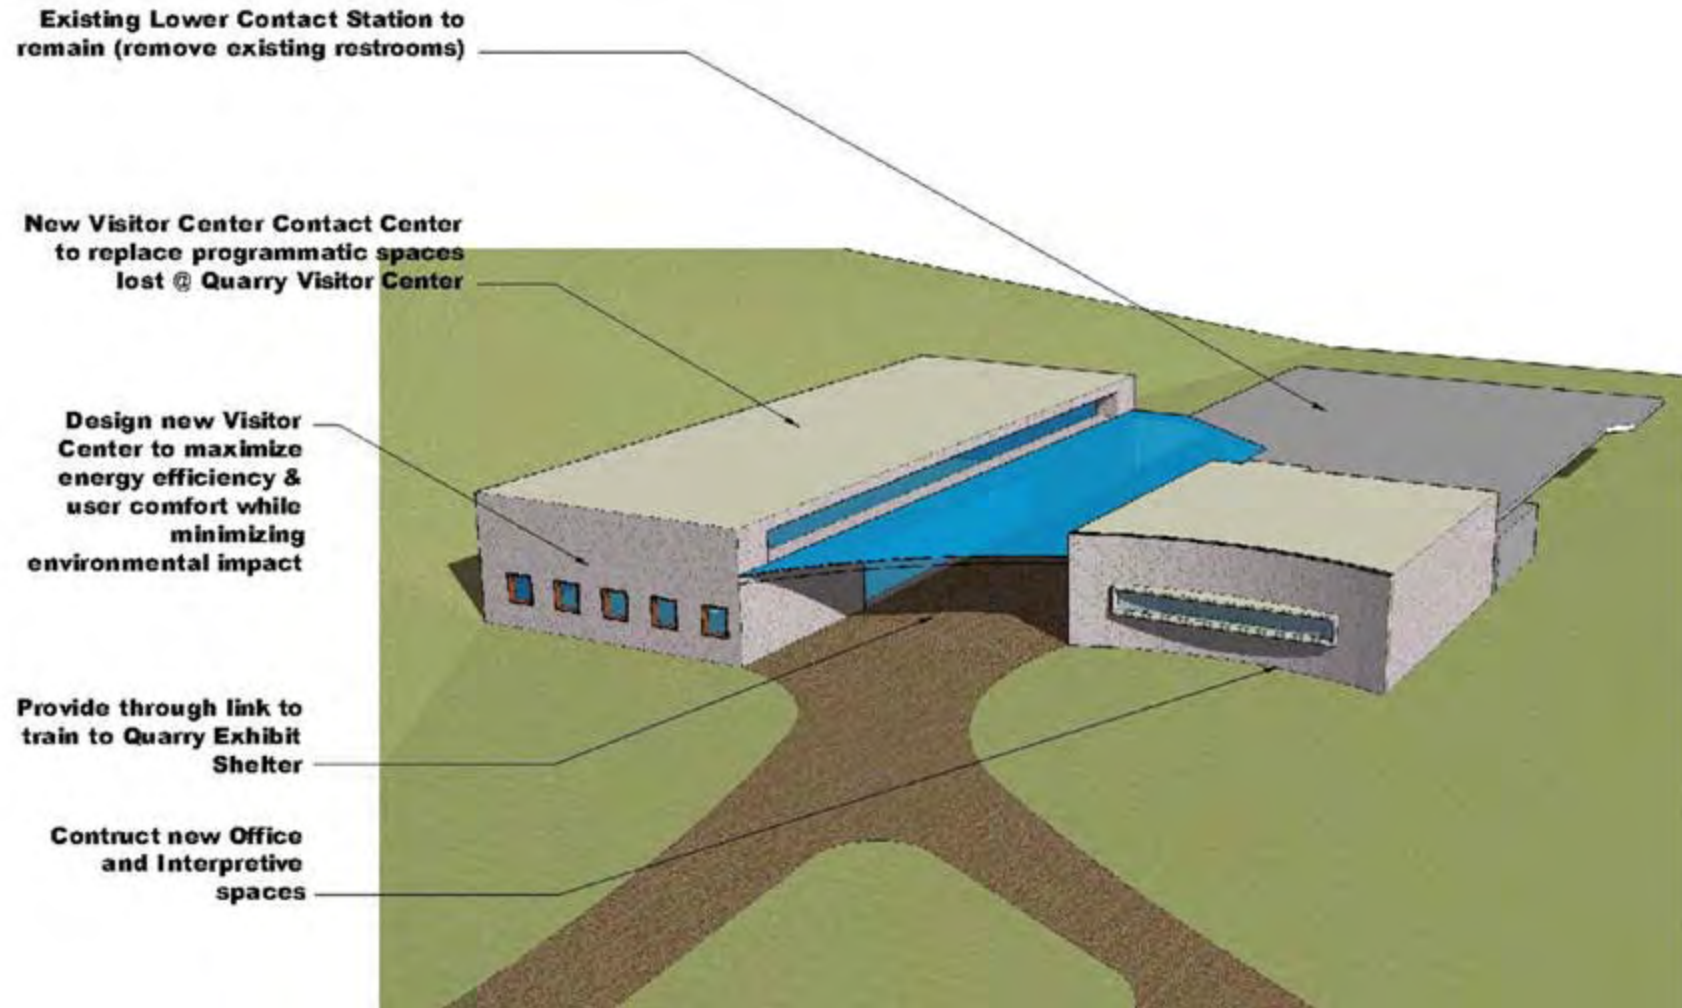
L ALTERNATIVE B QUARRY SITE LAYOUT CONCEPT
